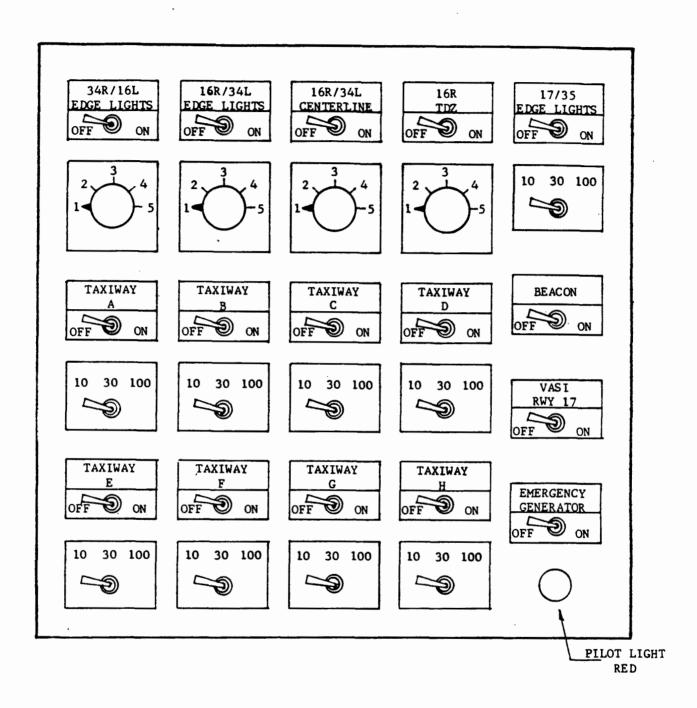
TYPICAL CONVENTIONAL LIGHTING CONTROL PANEL LAYOUT.
